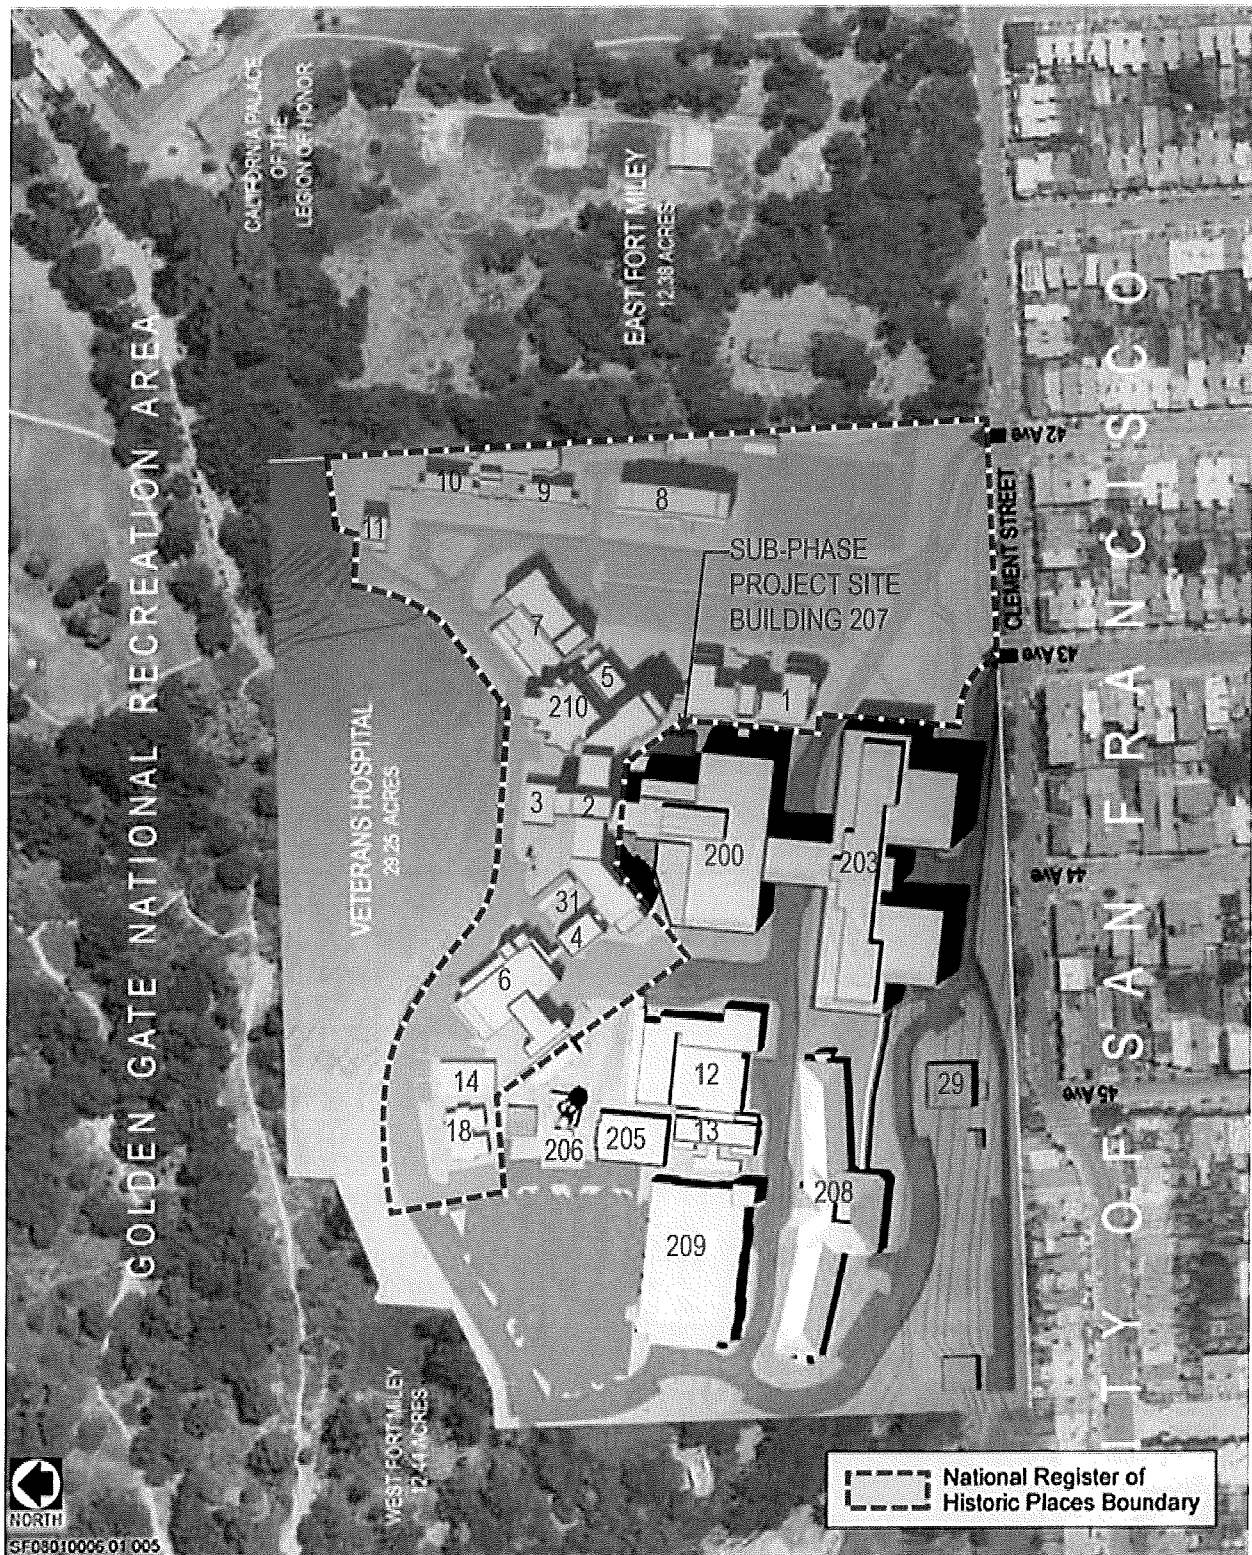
Existing Conditions Photographs / Massing Drawings
